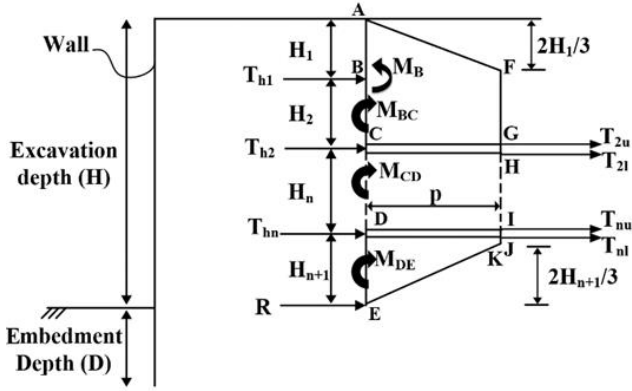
Earth pressure envelope acting on multiple anchored sheet pile walls (FHWA 1999)
